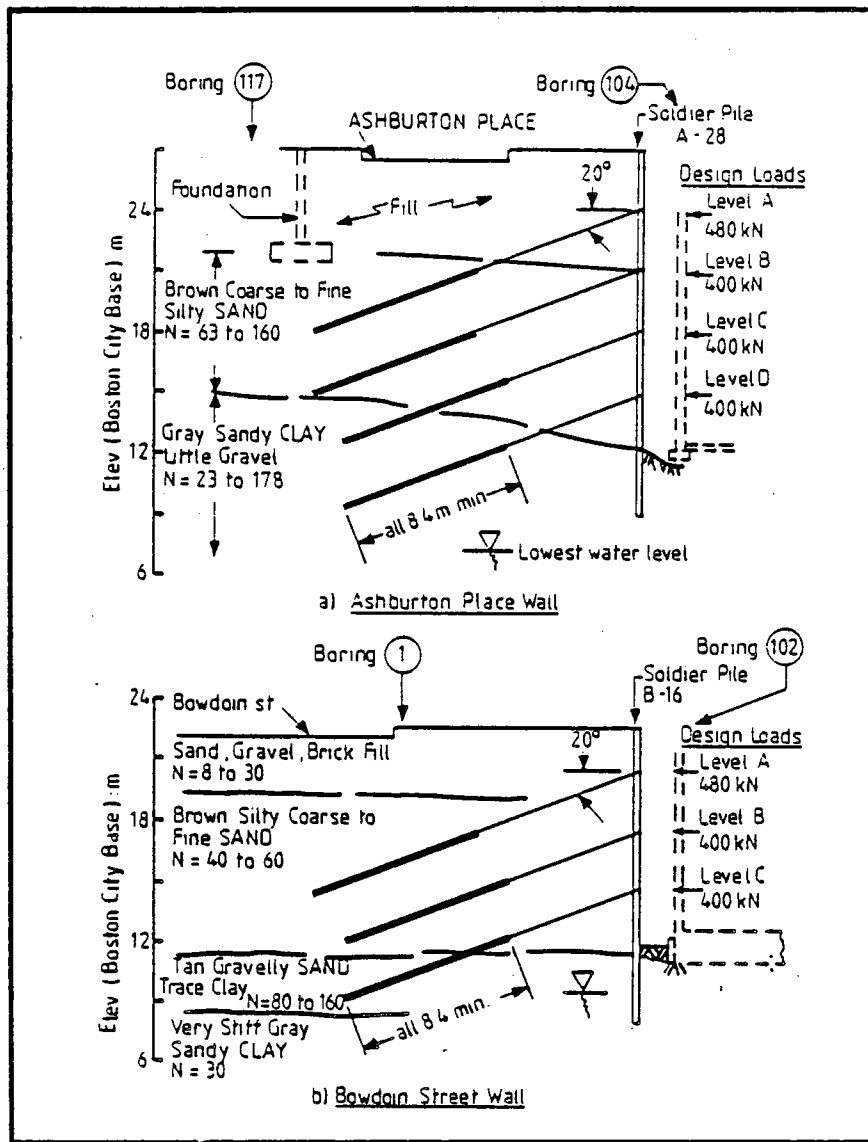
Typical anchored retaining wall, Boston (Oosterbaan and Gifford, 1972)
